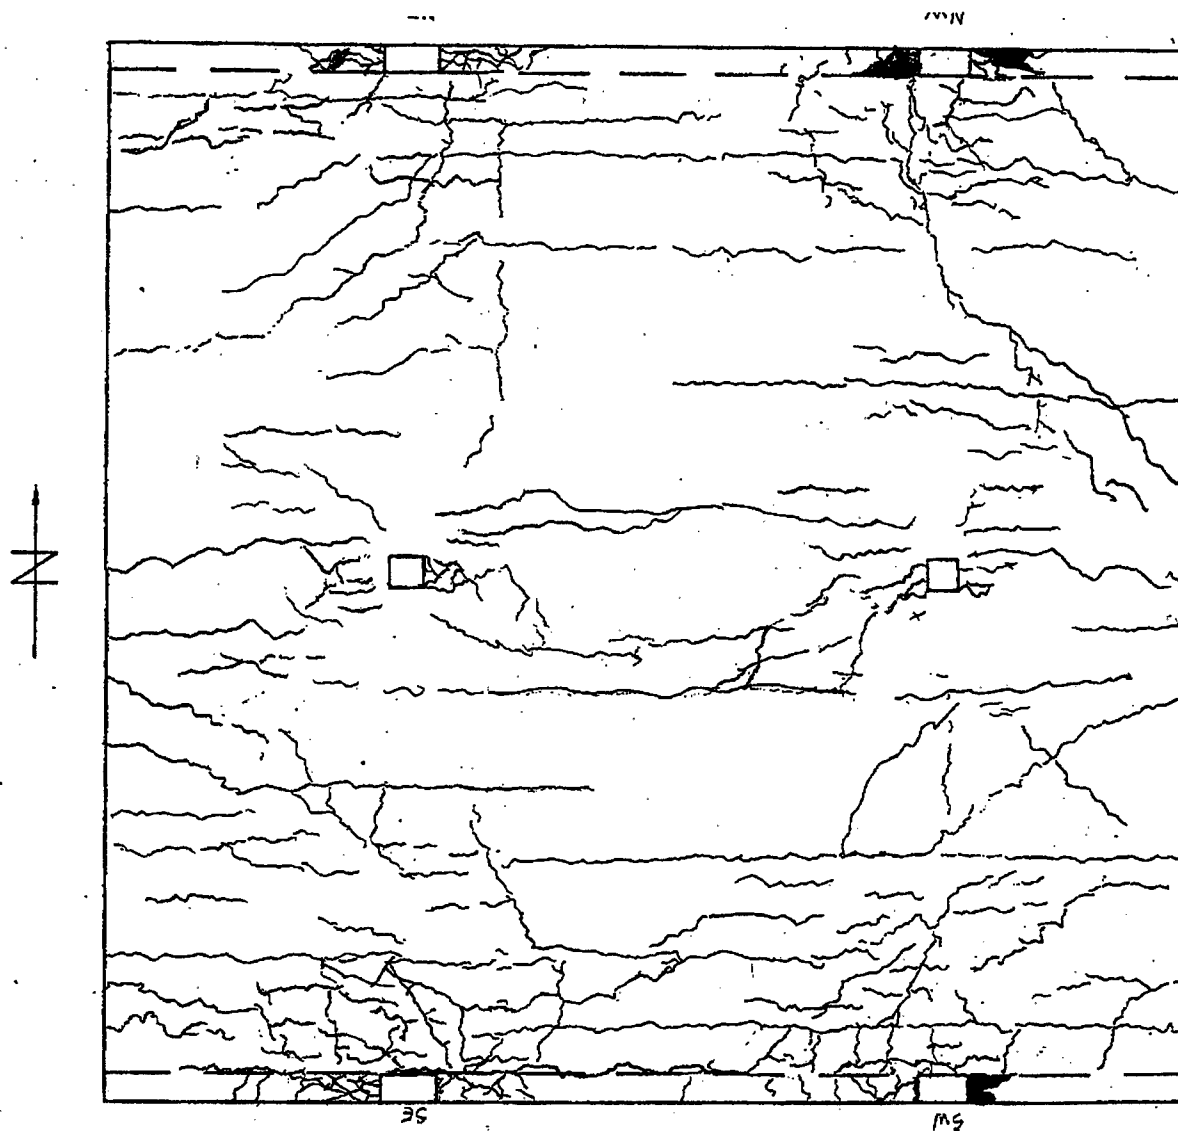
Crack Pattern, Second Floor Slab, Bottom Side, Post-E200N
